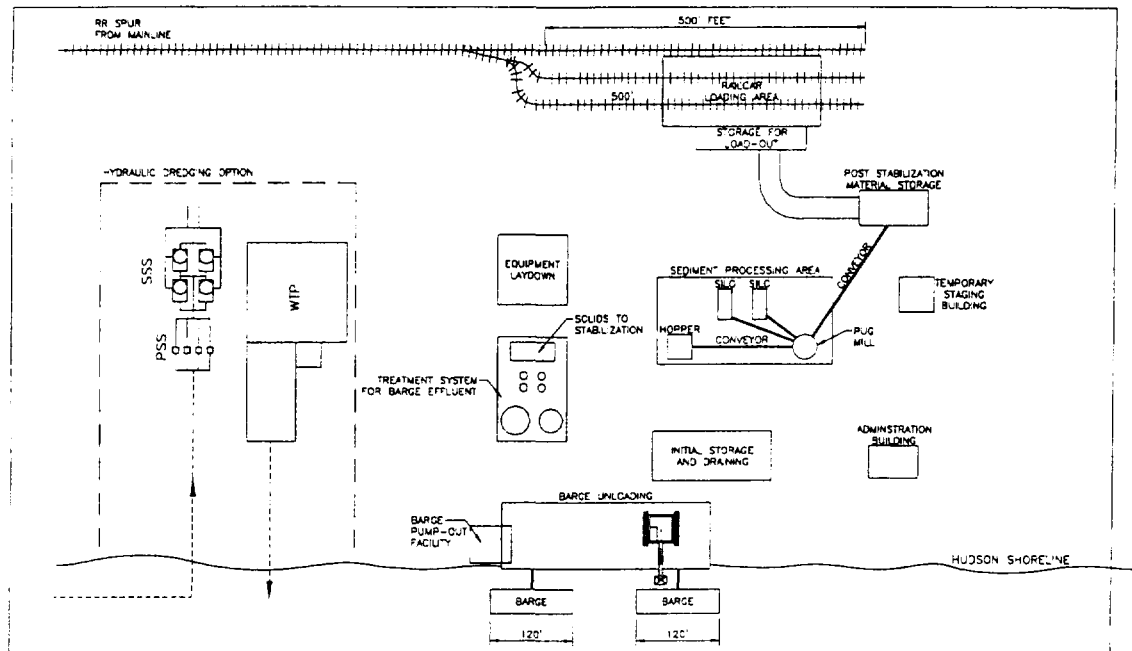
, NORTHERN PROCESSING SITE (NPS) - CONCEPTUAL LAYOUT
